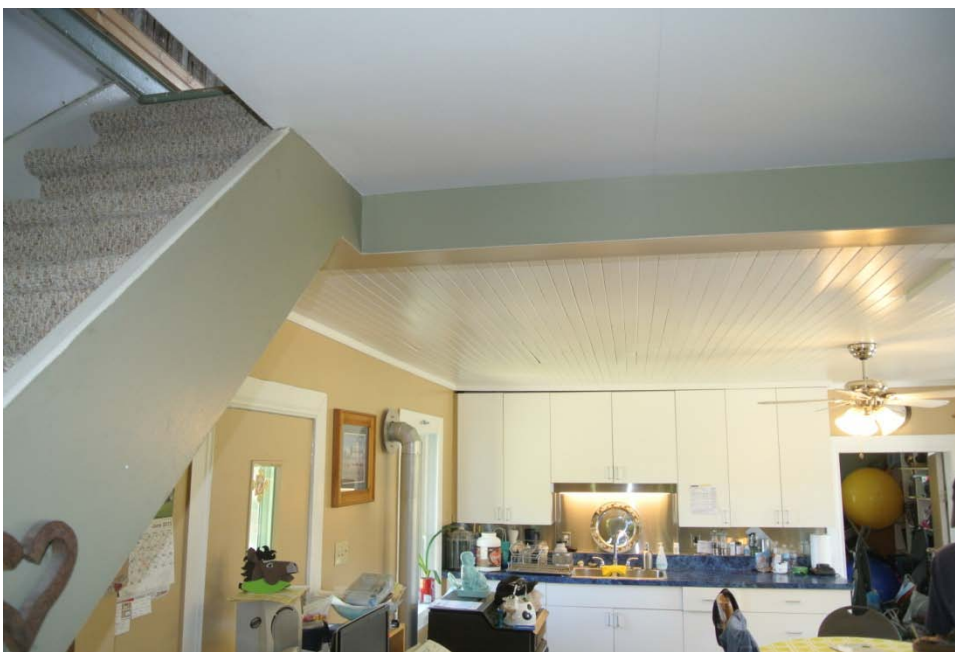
View to the kitchen from the front of the house. Note the narrow wooden ceiling slats.
